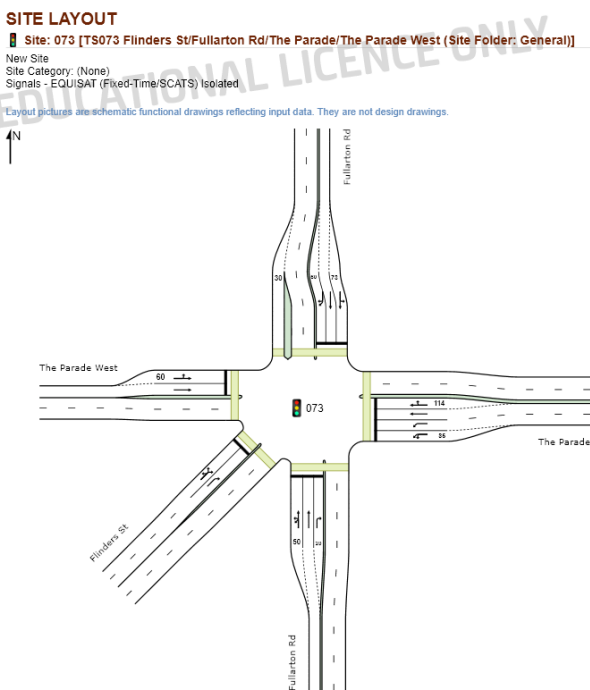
Fullarton Road-The Parade Intersection Site Layout
